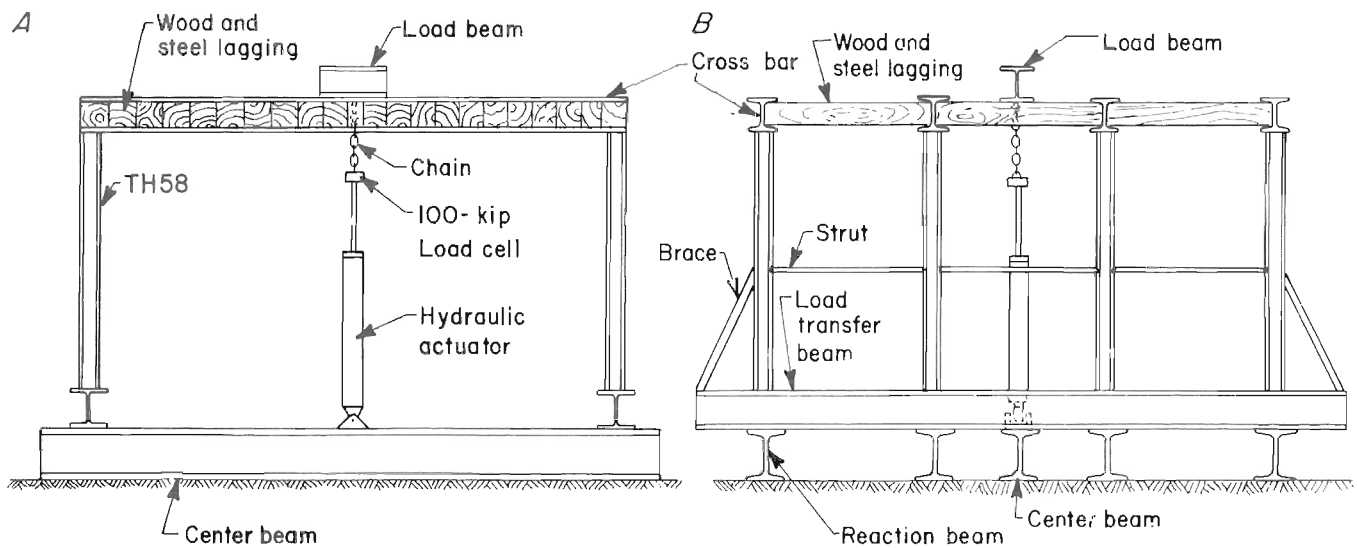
Yielding tri-set static test configuration. *A*, Front elevation view; *B*, side elevation view.
